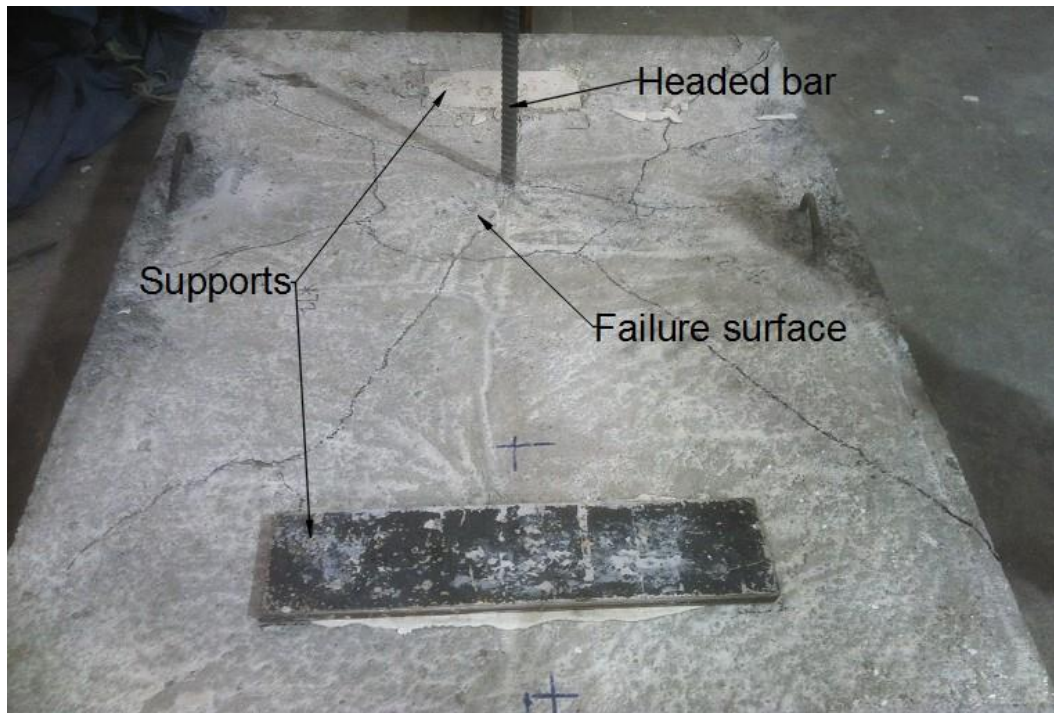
Breakout failure of shallow embedment pullout specimens from test Series 1 to 5.
